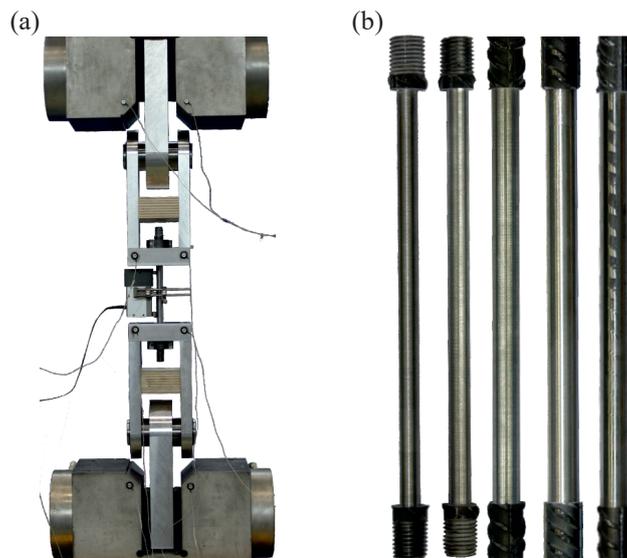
(a) Heads of universal testing machine with specimen, spherical hinges and LVDT; (b) specimens with residual diameter 11, 13, 16, 18, and 18.5 mm.
